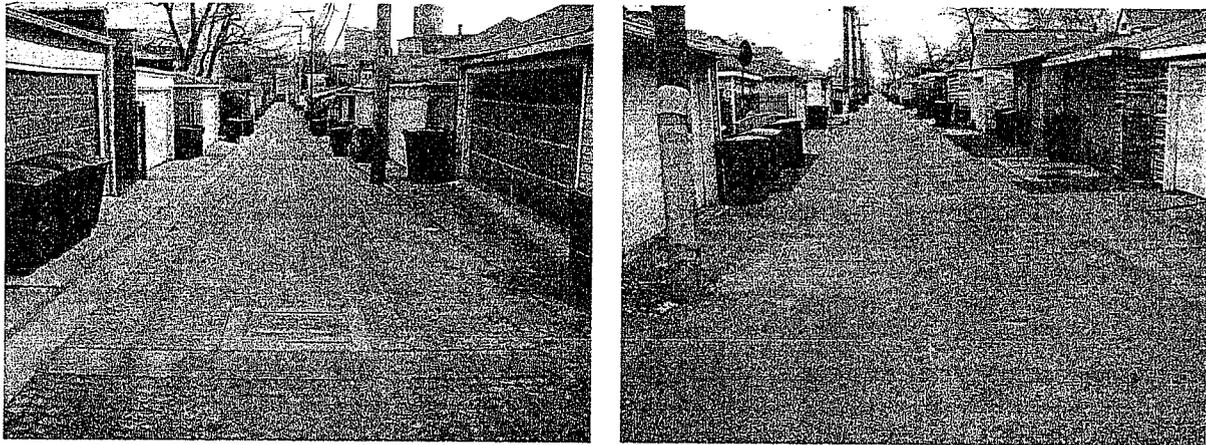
Permeable Pavers and Permeable Concrete Chicago Alleys
